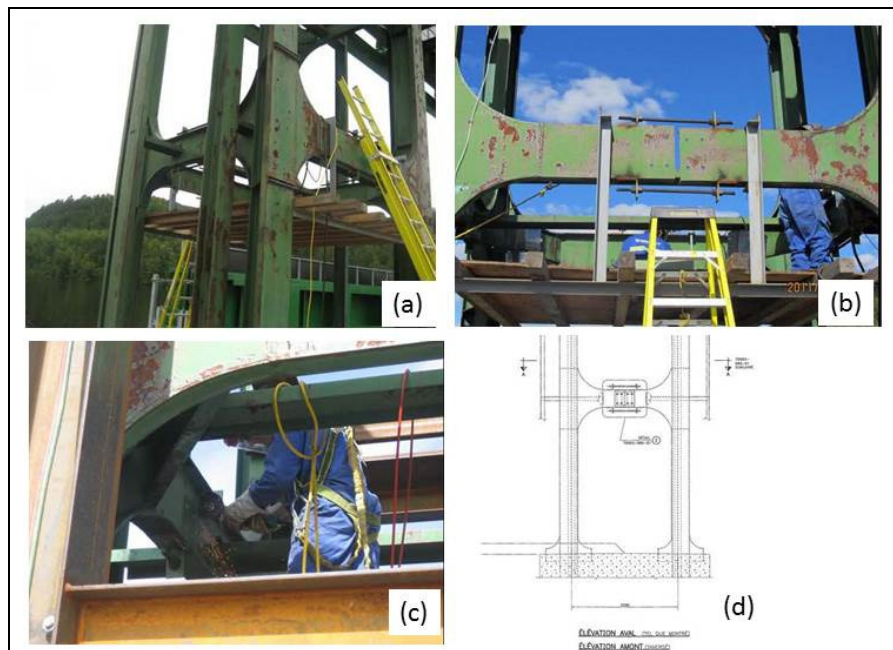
La Tuque hoist supporting structure: adjustable lower member
